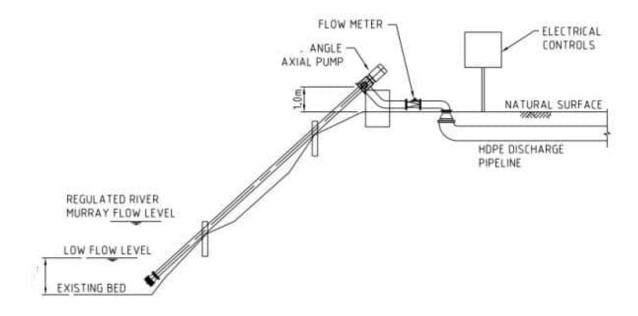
Concept Design Pump Station Arrangement (Indicative)
